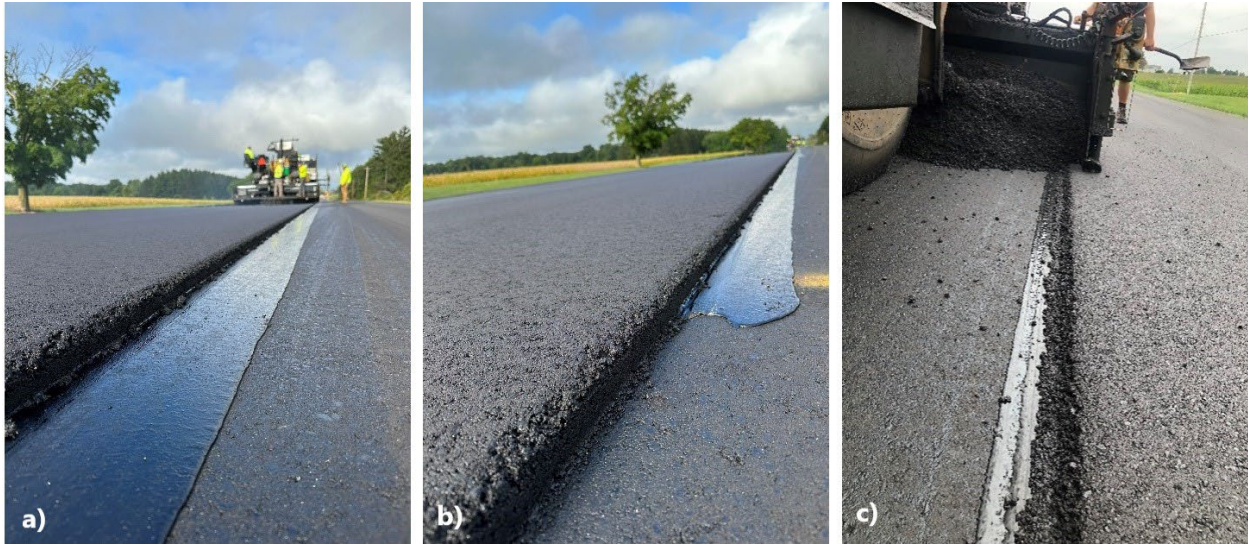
Paving of First Pass Covers Half of the VRAM Width (a); Paving Process Does Not Change When Covering VRAM (b); Paving Second Pass Covers the Remaining VRAM to Create the Construction Joint (c).
